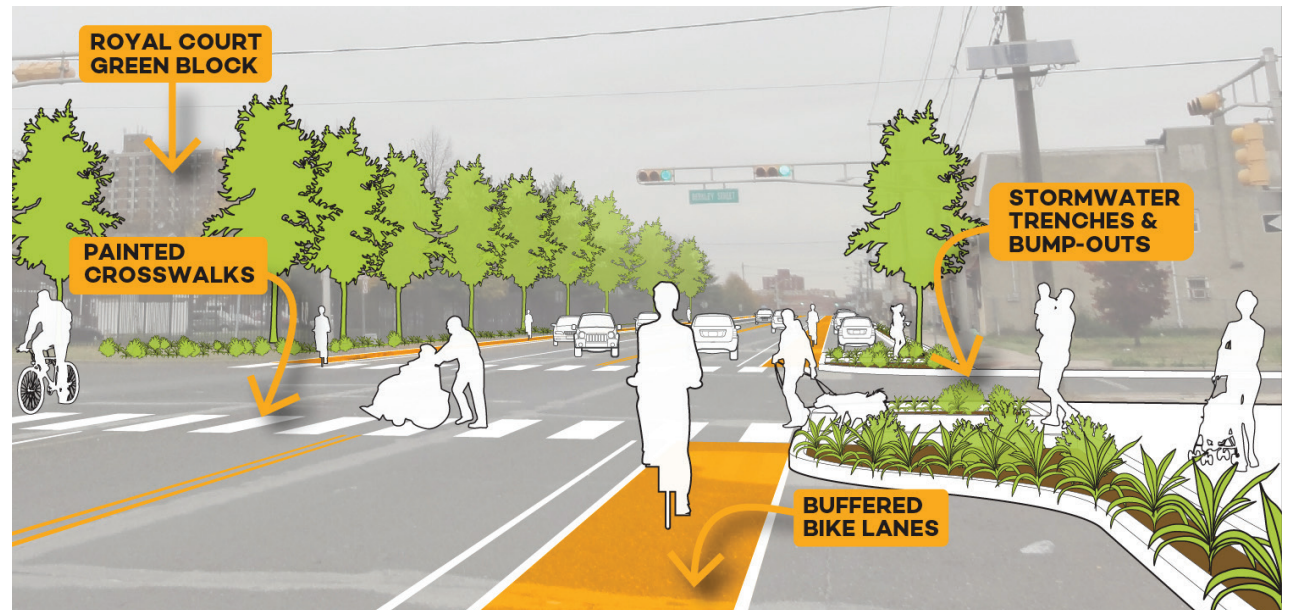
VIEW OF PROPOSED GREEN STREET ON 3RD STREET
